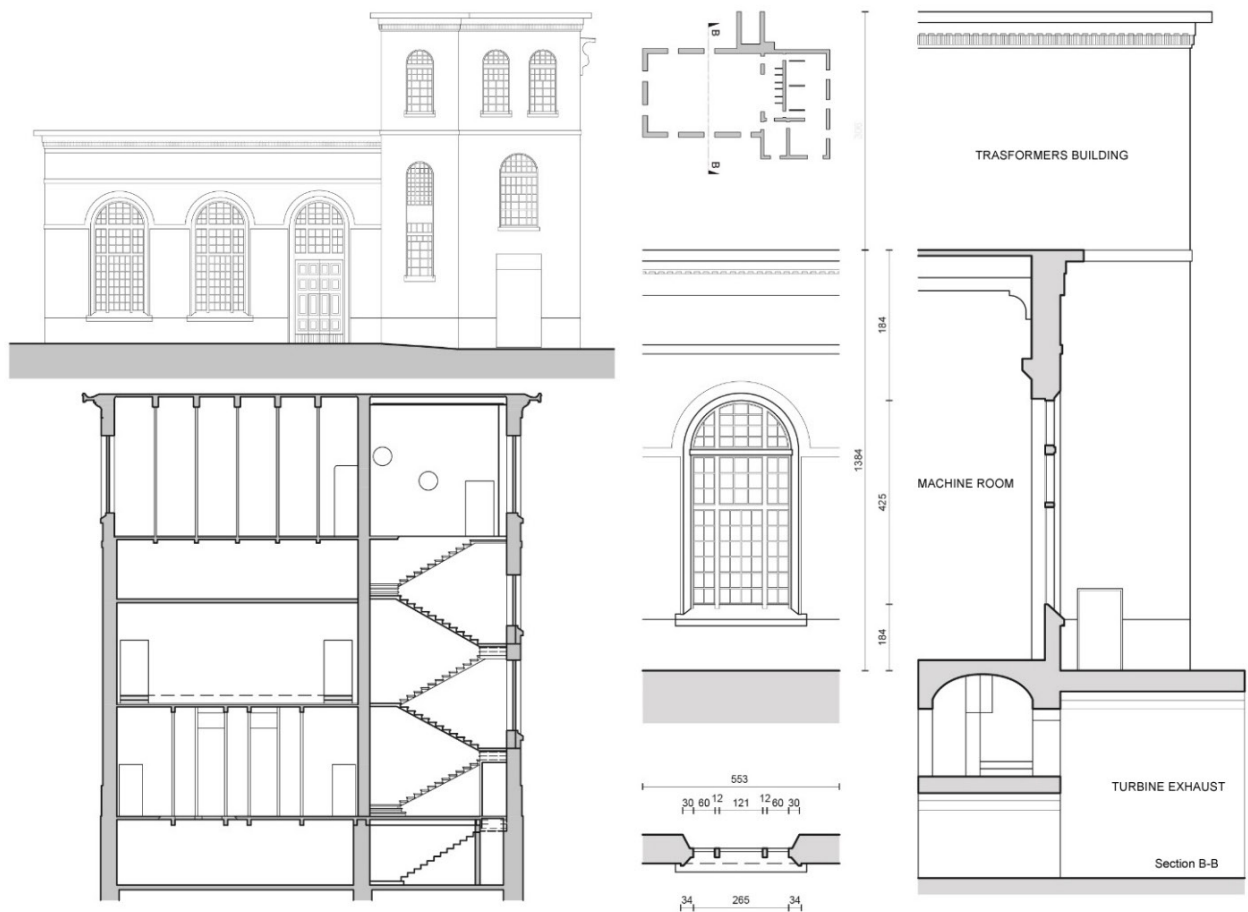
Partidor power plant. Left from the bottom, eastern elevation and main gateway, the cross-section of northern building. Right: architectural layout of southern and western elevations © F. Chinellato, L. Petriccione.
